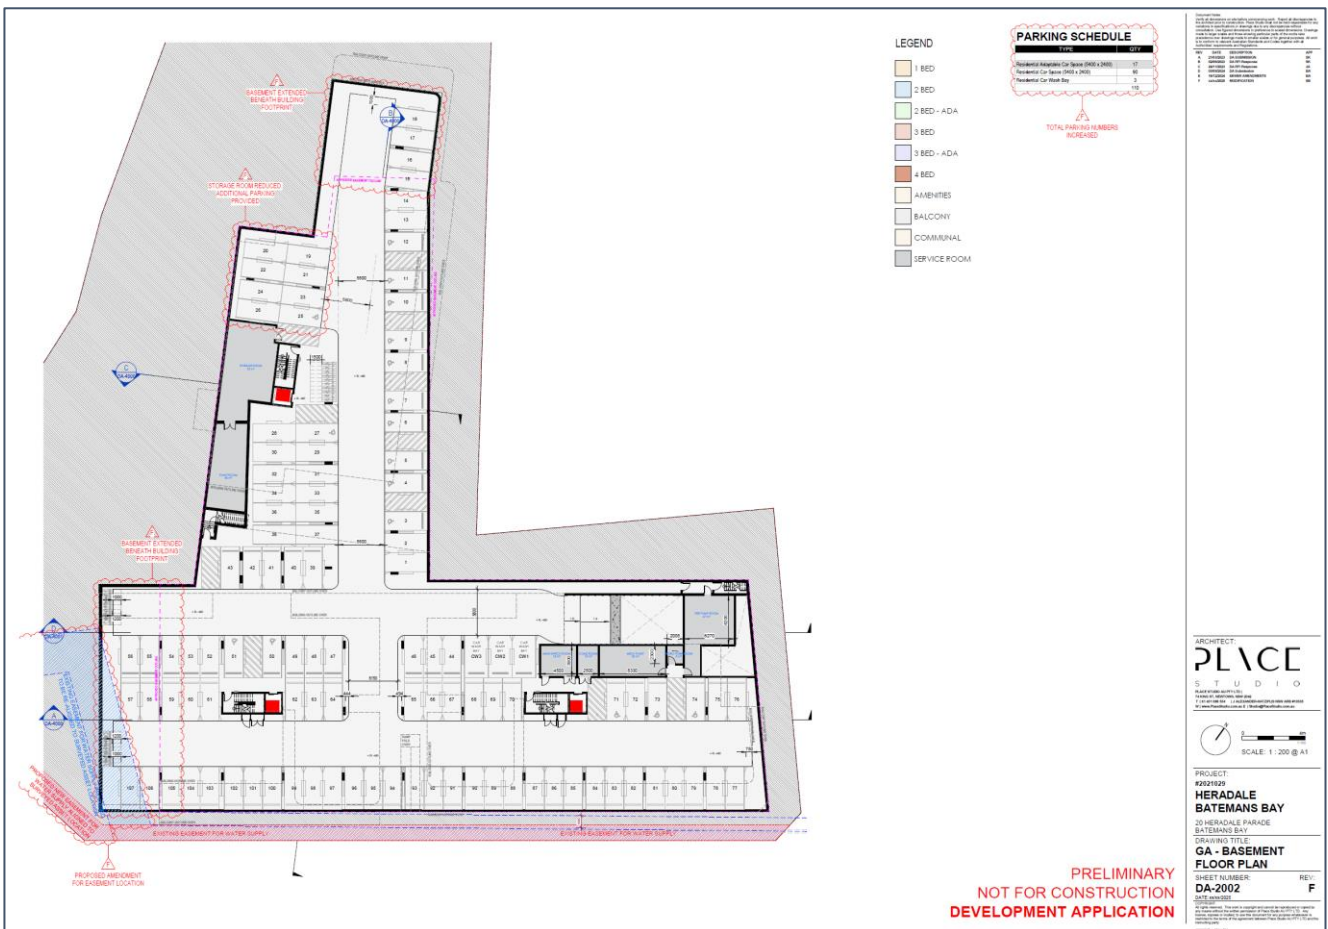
Proposed s4.55(2) basement plan (Source: Place Studio AU Pty Ltd)
